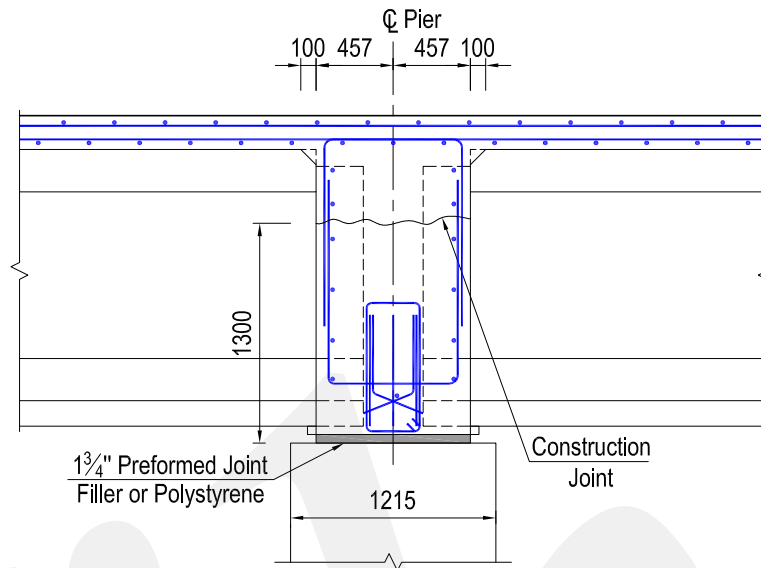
Detail of a cast-in-place diaphragm. Note: All dimensions are in millimeters. 1 mm = 0.0394 in. 1" = 1 in. = 25.4 mm.
